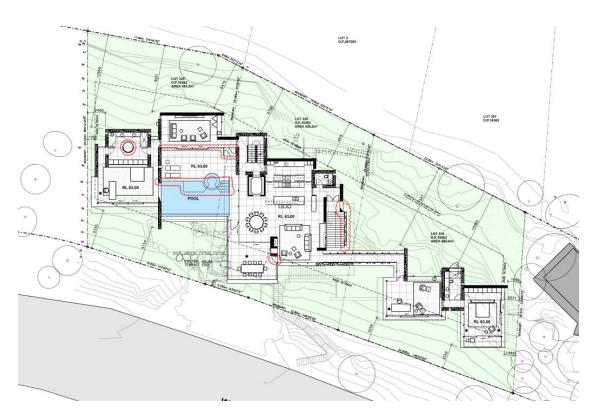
Extract of site plan 2 (Source: Harry Seidler & Associates)
